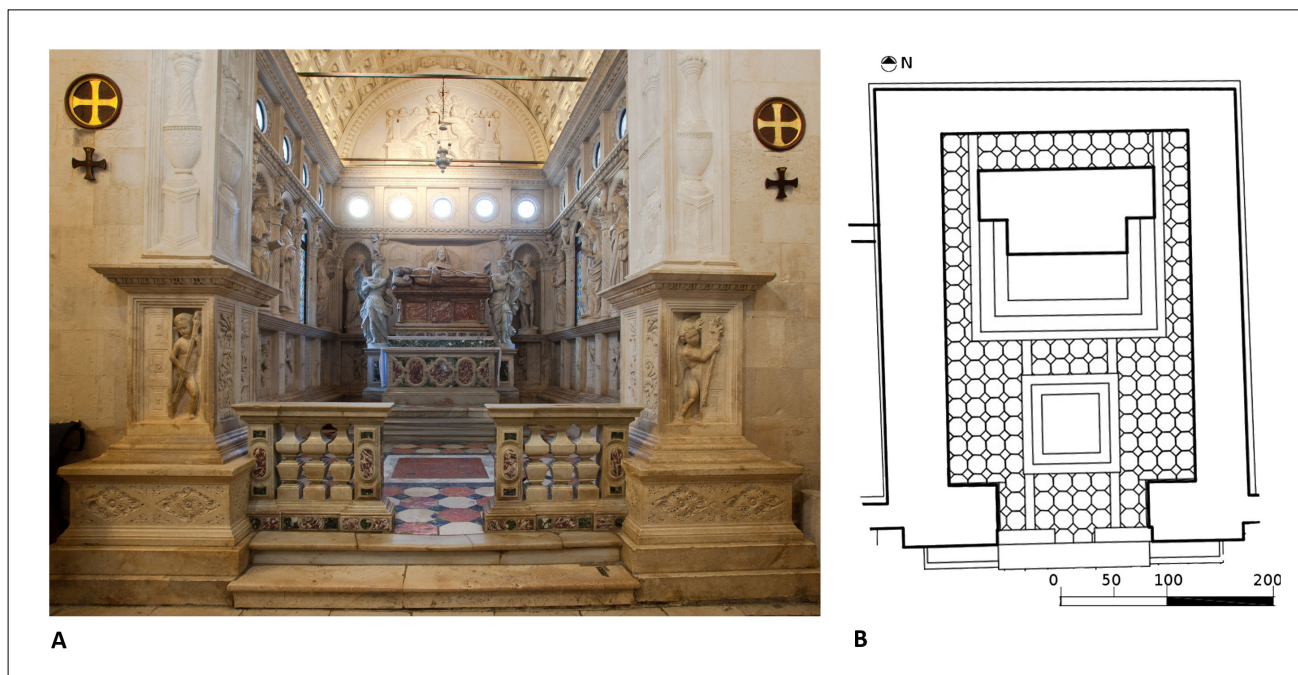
Chapel of St. John of Trogir: A. View (photo: Z. Sunko); B. Plan (Neir d.o.o.)
